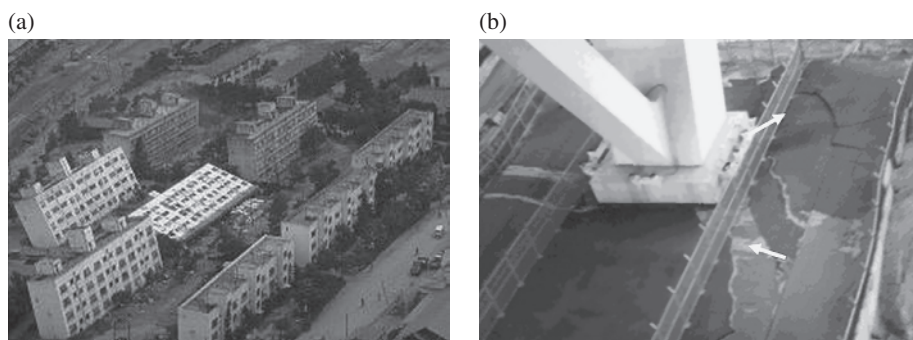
Collapses due to soil liquefaction: settlement and tilting of buildings in the 1964 Niigata (Japan) earthquake (a); soil boils and cracks at pier foundations of Nishinomiya-ko bridge in the 1995 Kobe (Japan) earthquake (b). (After NISEE.)
